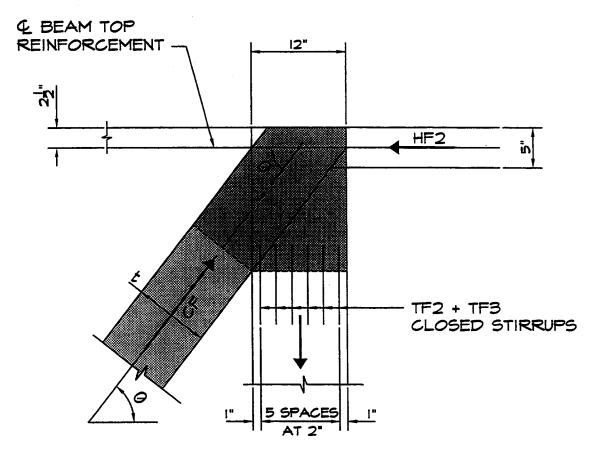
Diagonal Compression Strut at BSF 200/50 Connection
